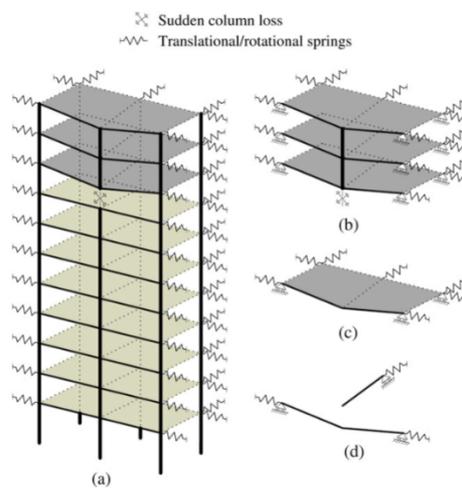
Structural idealisation levels for progressive/disproportionate collapse assessment. (a) Affected bay, (b) Floor(s) above lost column, (c) Single floor above lost column and (d) Individual steel/composite beam above lost column (Izzuddin et al., 2008)
